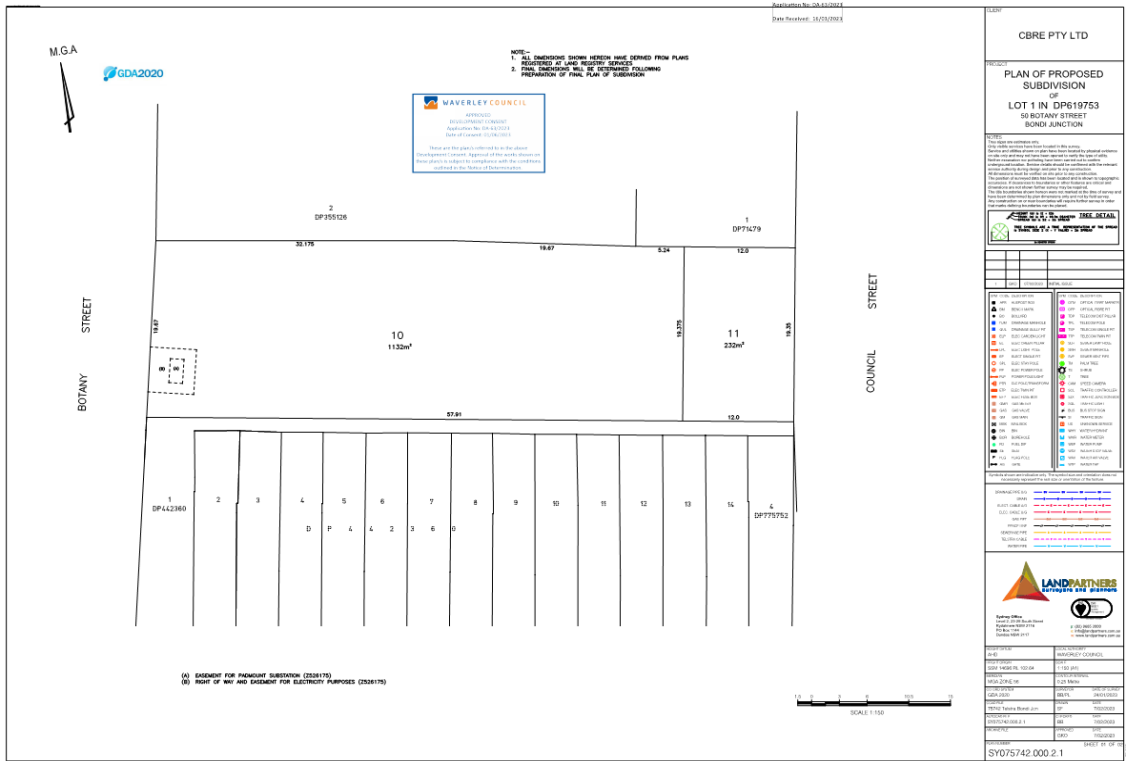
Approved Plan of Subdivision (Source: Waverley Council DA Tracker, 2023)
